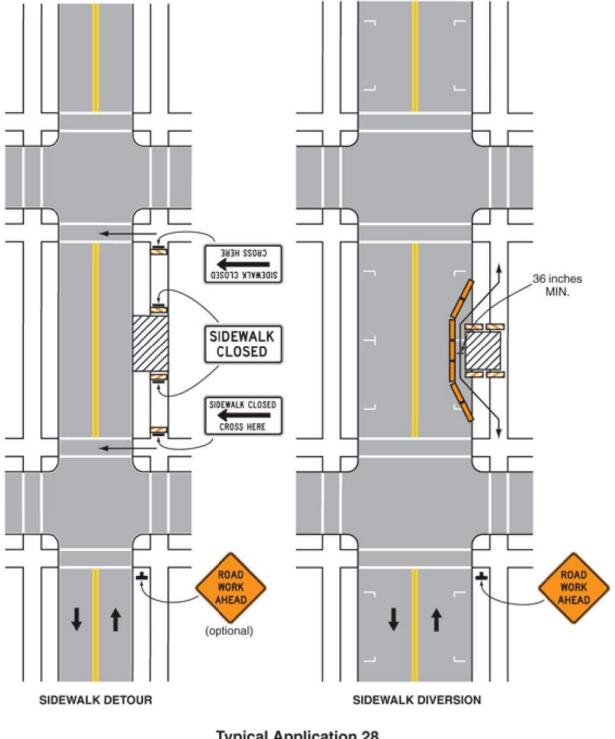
H-28. Sidewalk Detour or Diversion (TA-28)
